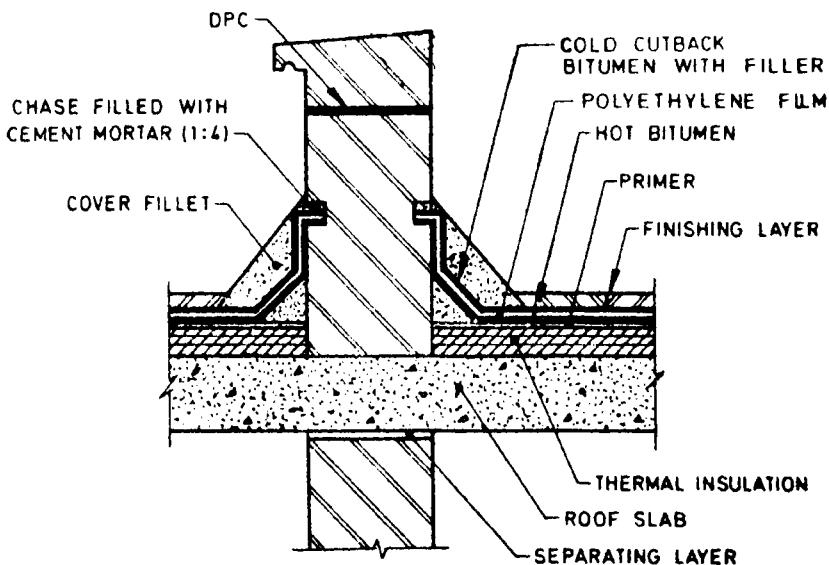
TYPICAL DETAIL OF WATERPROOFING TREATMENT FOR ROOF WITH PROJECTING FEATURES
